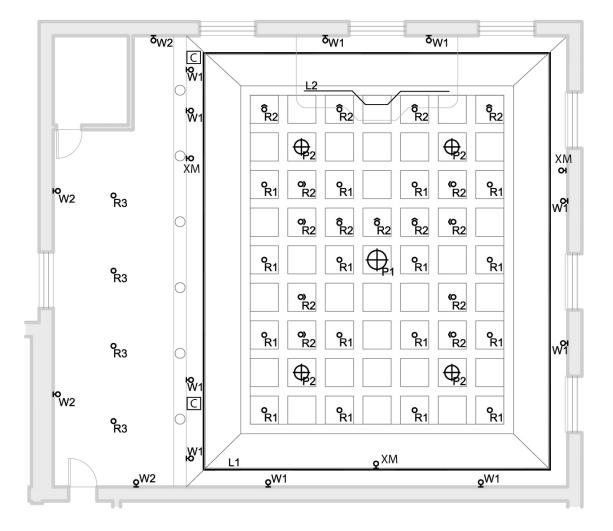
Reflected Ceiling Plan & Legend (Lam Partners)
